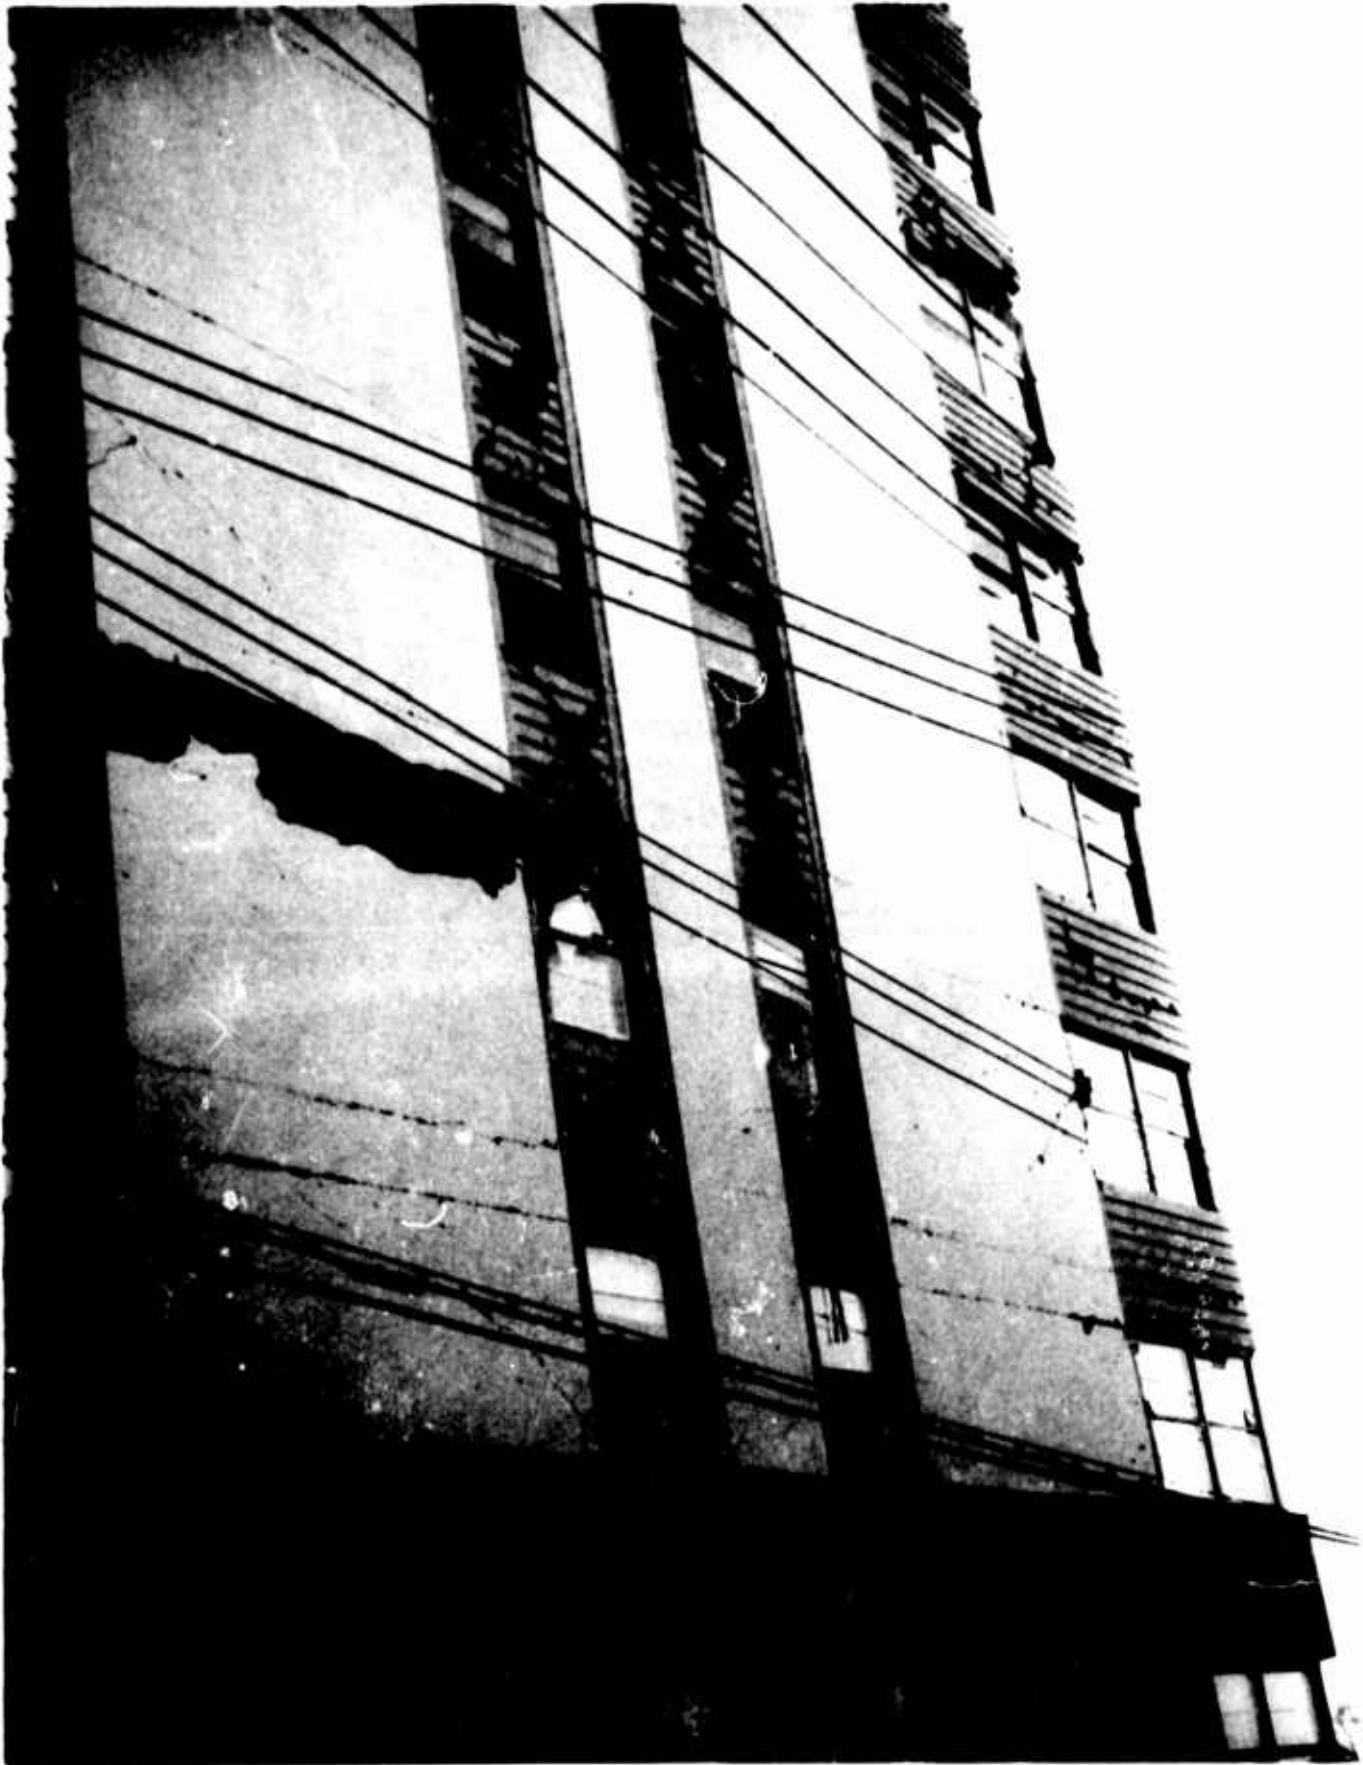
Mount McKinley Building (Exterior closeup of column wall fractures)
